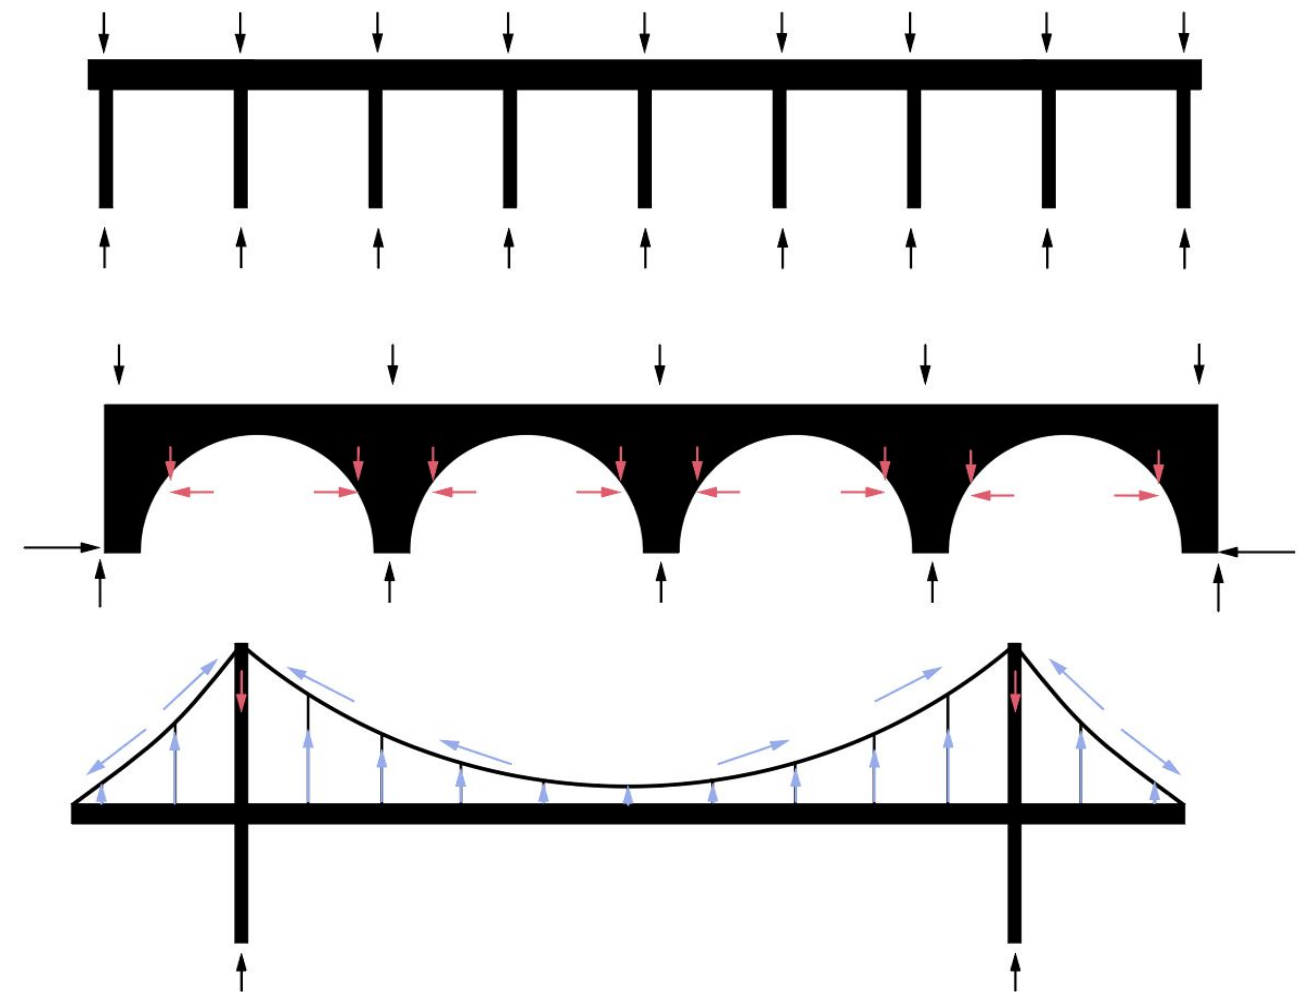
Bridge Structures Associated with Structural Behaviors
